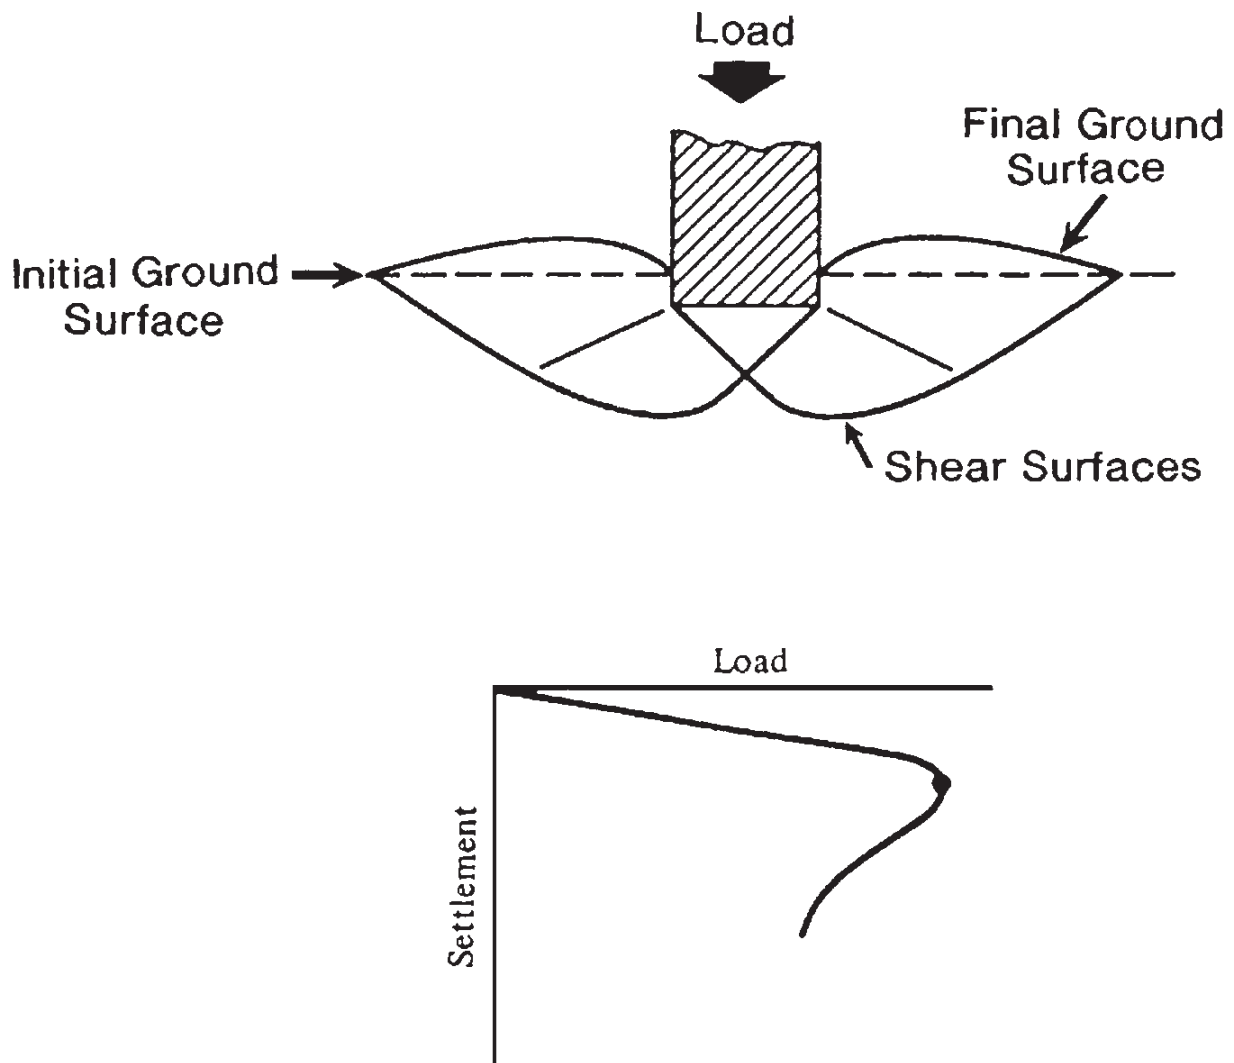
General shear foundation failure. (After Vesic 1963.)
